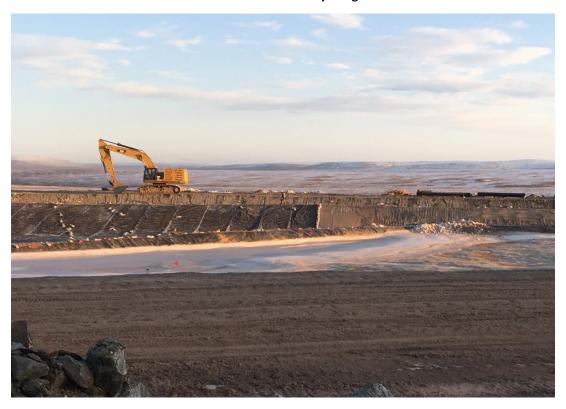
Repair and lining of the Waste Rock Facility Pond - September 2019
